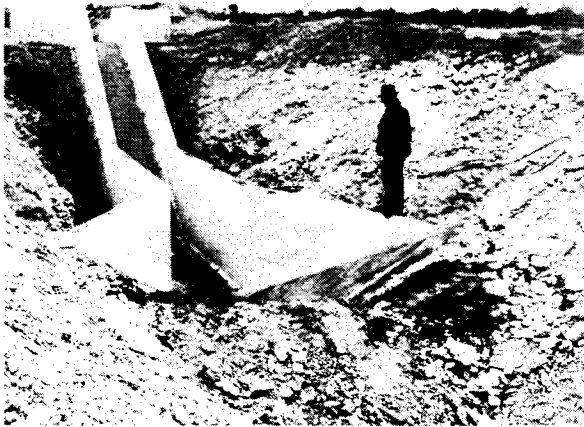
Rectangular inclined drop under construction. P 222-117-36402
